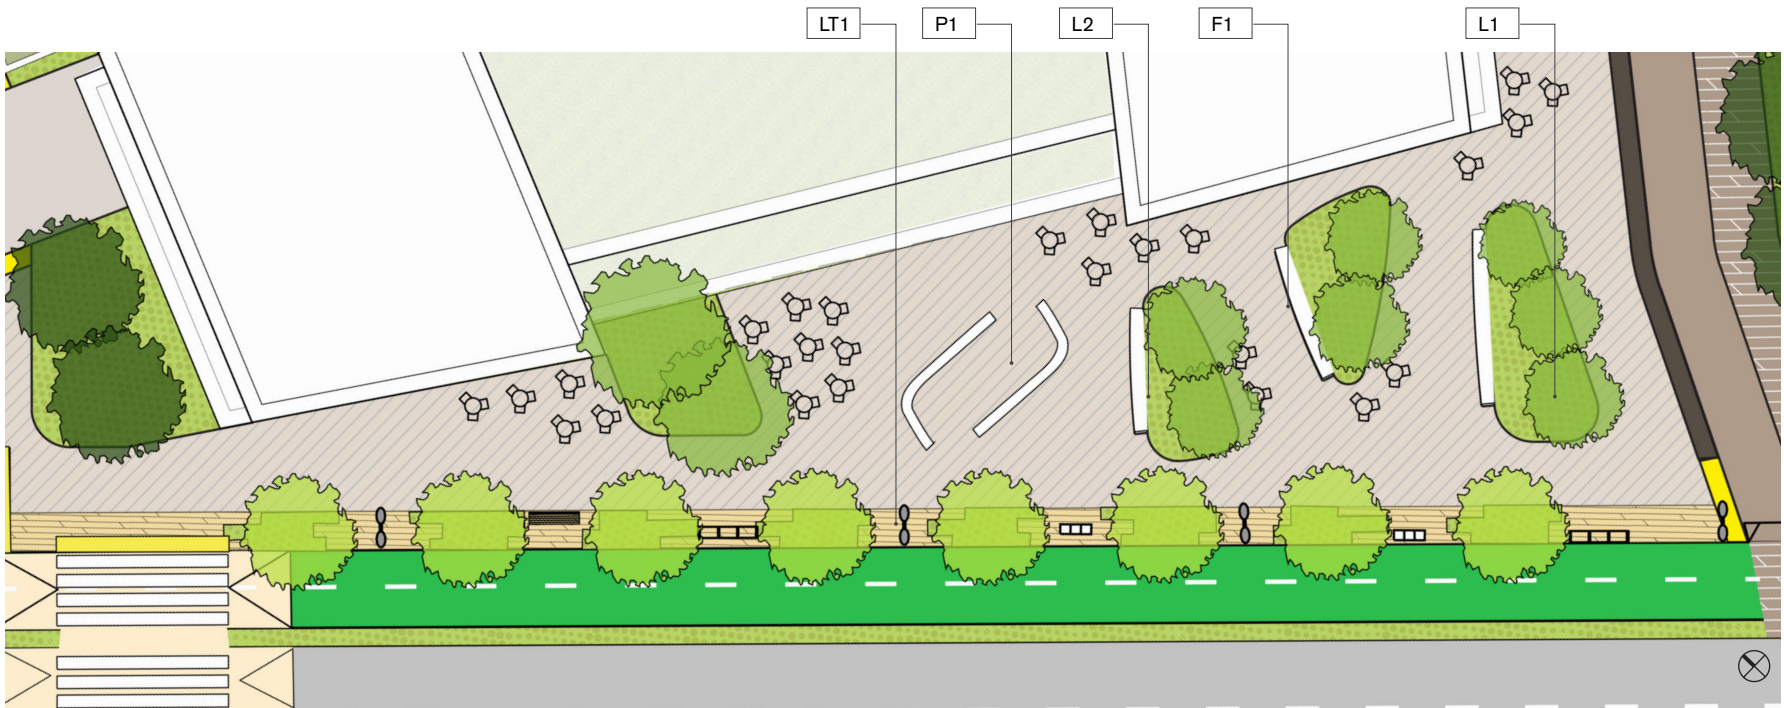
TOWN TRIANGLE ENLARGEMENT PLAN
